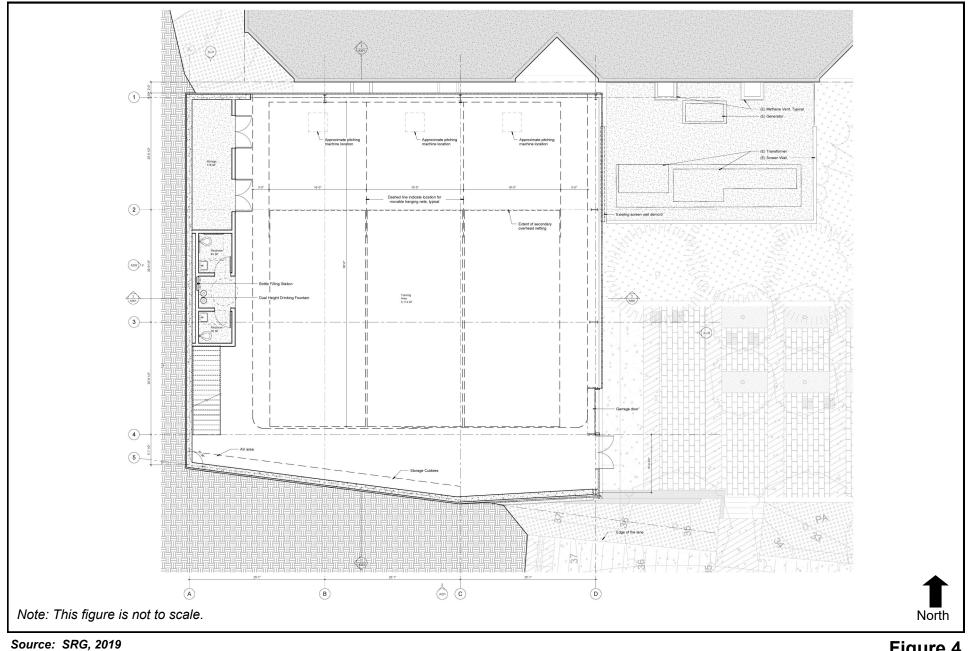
Floor Plan As part of the project, the portion of Snohomish Lane S within the project site would be shifted to the south. The roadway/walkway would continue to provide access through the site area and connect with Walla Walla Road NE and would be improved to be compliant with ADA accessibility standards.
